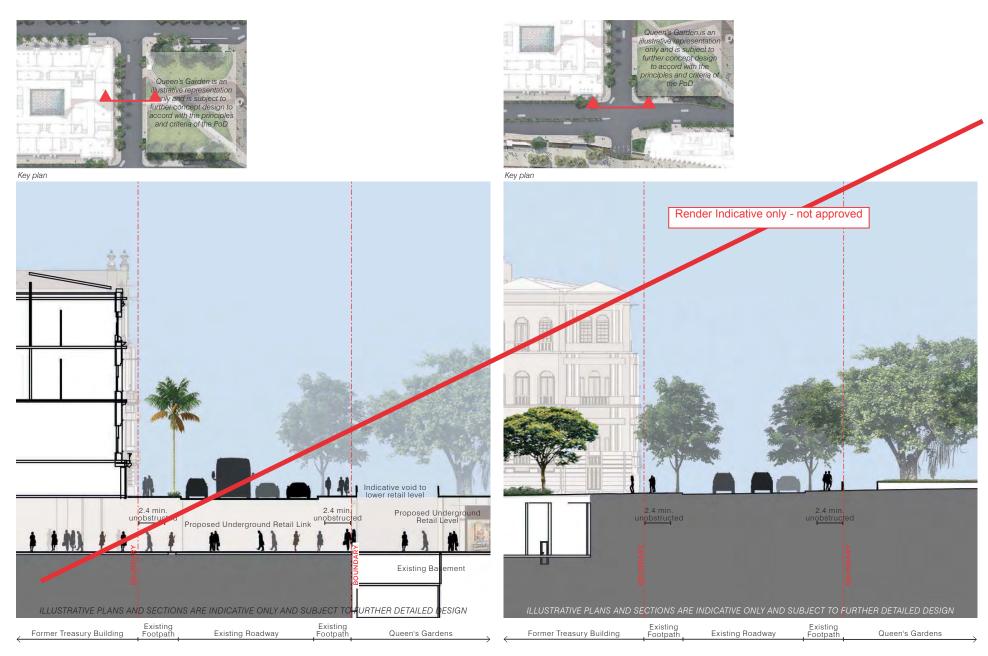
Elizabeth Street sectional elevation at Centre of Queen's Gardens and former Treasury Building
